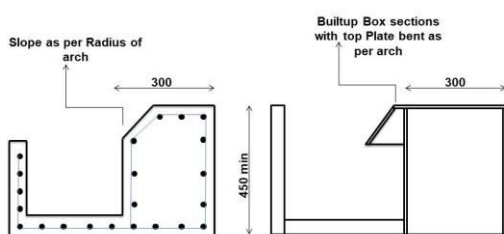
RCC & Steel Continuous Beam Support for Trussless Roof
